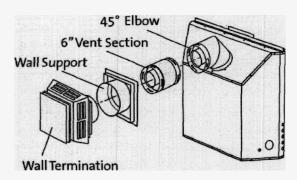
Typical minimum horizontal vent configuration - 5/8 Simpson Dura Vent. Donot use 4/6 pipe in this configuration.
